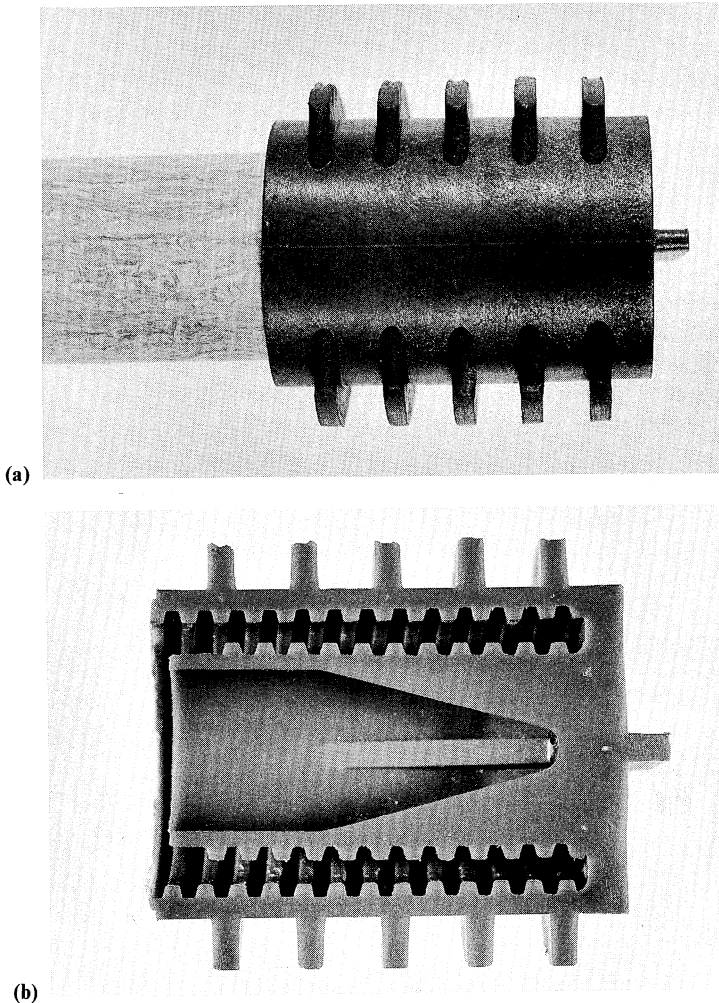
(a) Composite end cap for forming nodal joints. (b) Section through composite end cap for forming nodal joints.
